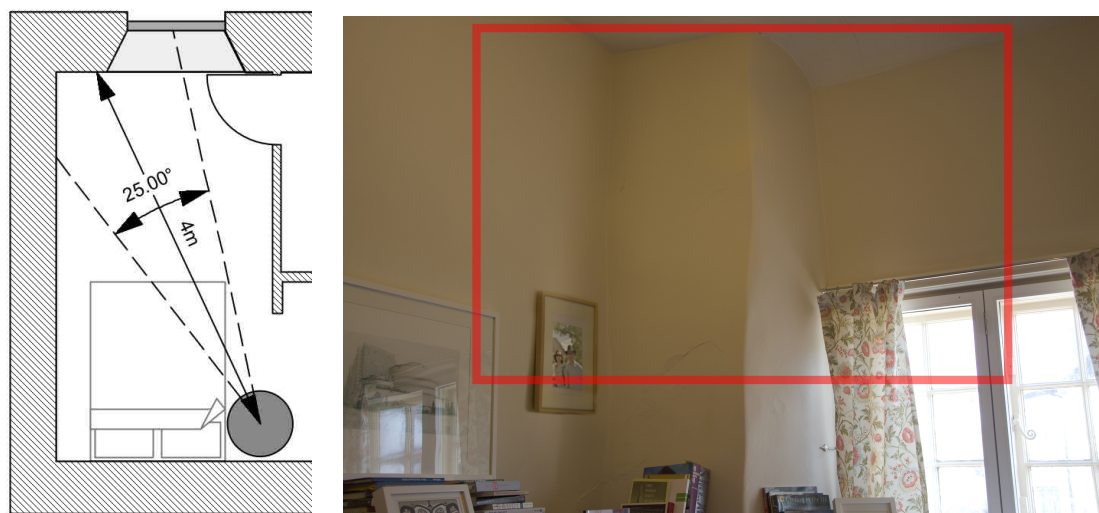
Plan and photo of building 1, study 3. Red box shows limit of thermal camera FOV.
